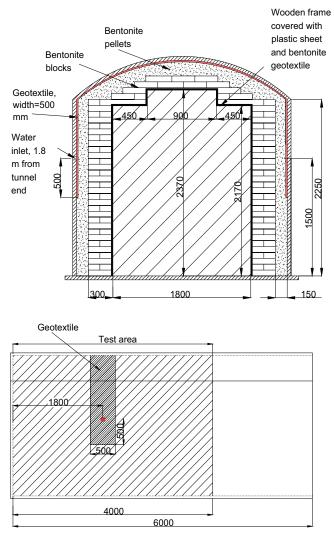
Schematic of the ½-scale test tunnel. Upper: Cross-section showing the central mould of wood, the block stack and the pellets. Lower: Steel tunnel from the long side showing the position of the geotextile. The backfill front can be seen on the right side.
